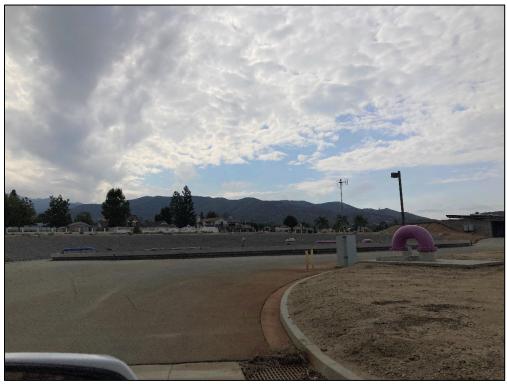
Existing YVWD water facility at the proposed location of 14.1 booster site; facing east.
